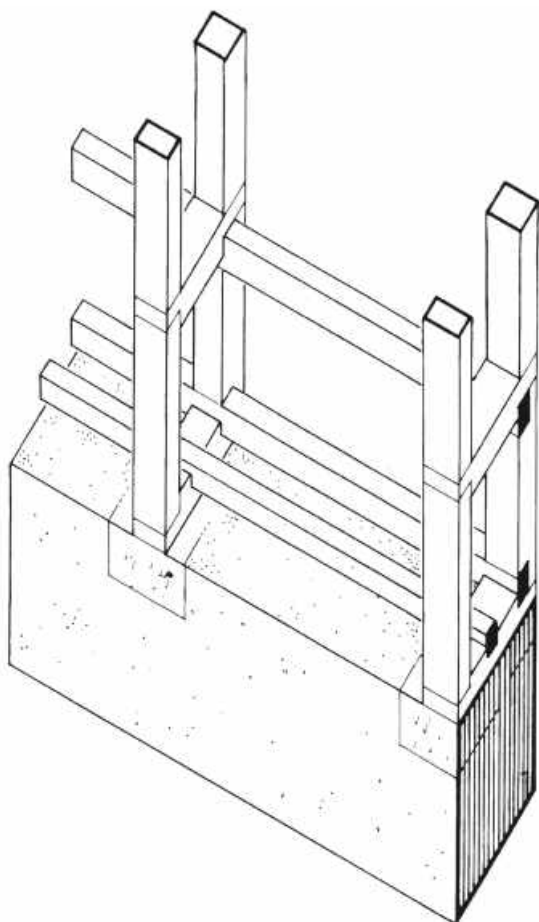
Horizontal timber ties, typical detail (Palyvou, 1999)
